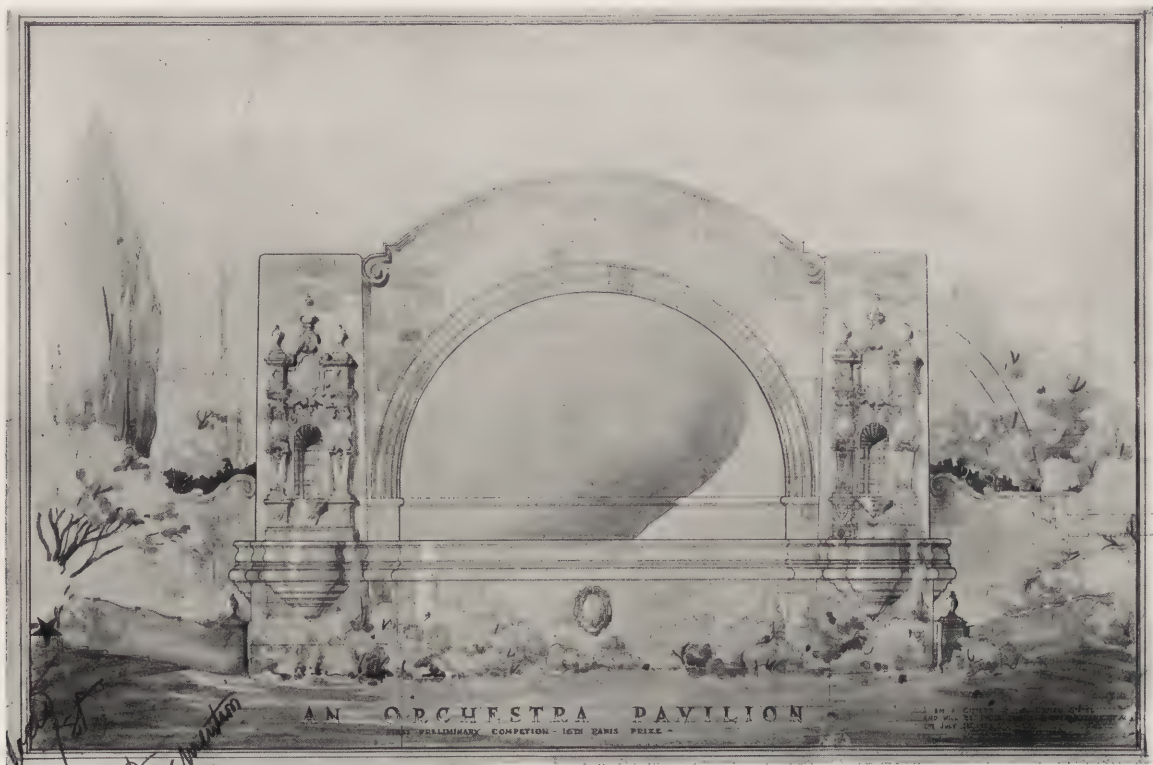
"An Orchestra Pavilion." By P. O. Davis, Los Angeles Architectural Club.
